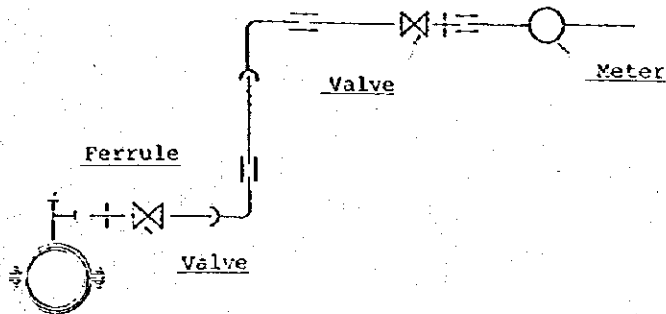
LAYOUT OF THE EXISTING SECONDARY MAINS
